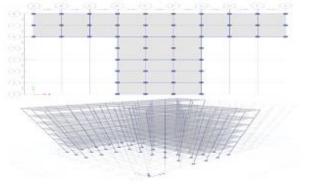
plan and 3D Elevation of T-Shaped Building
